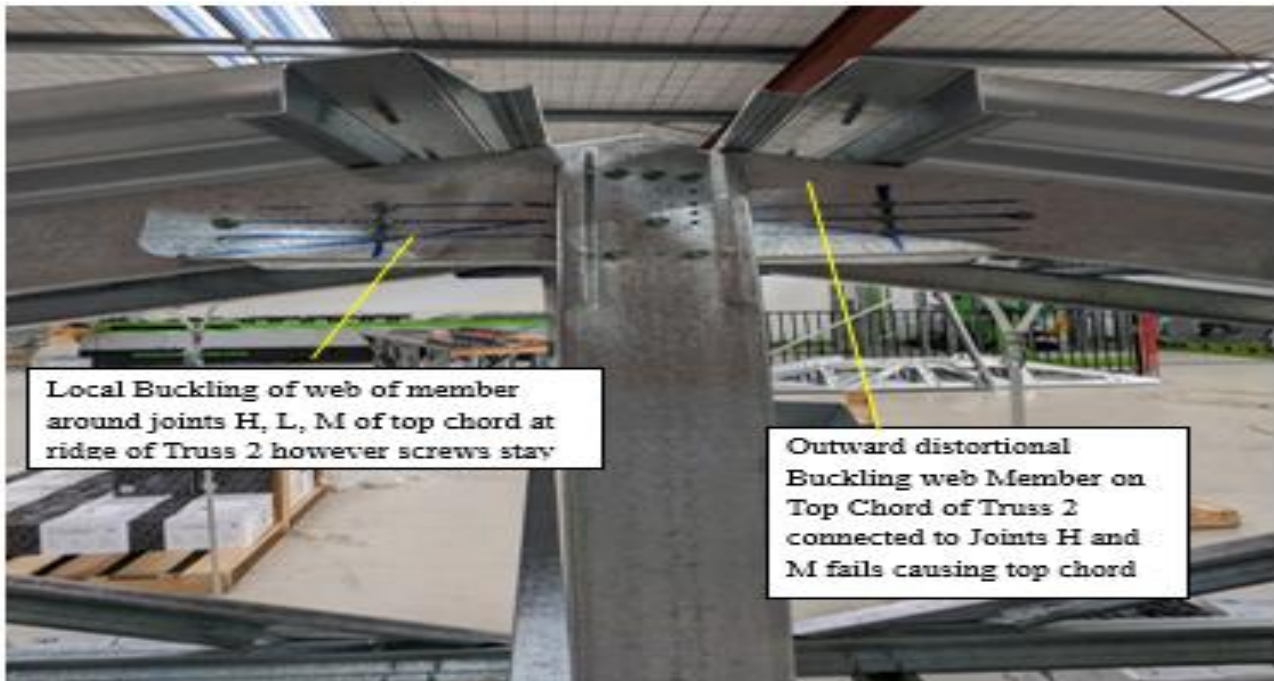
Outward distortional and local buckling failure on Truss 1 of Test 1
